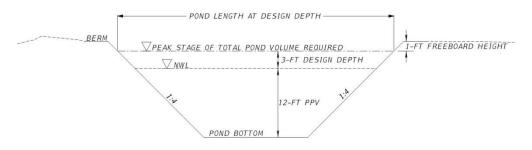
POND SIZING TYPICAL SECTION (NOT TO SCALE)
